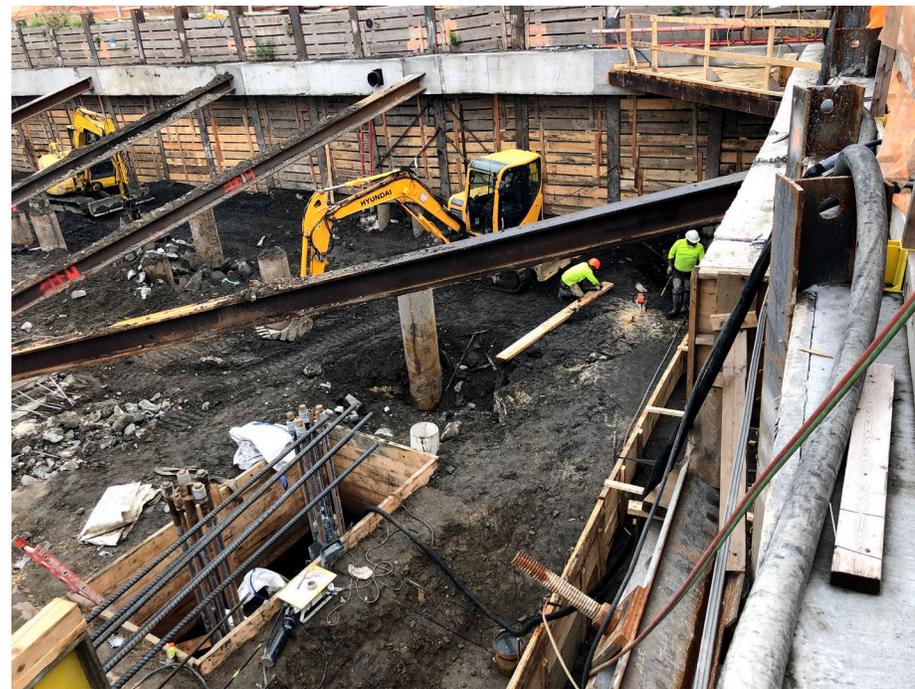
Looking southeast, New Leaf waterproofing SOE and pouring concrete onto the ground in WCF-A1 to create a mud slab.
